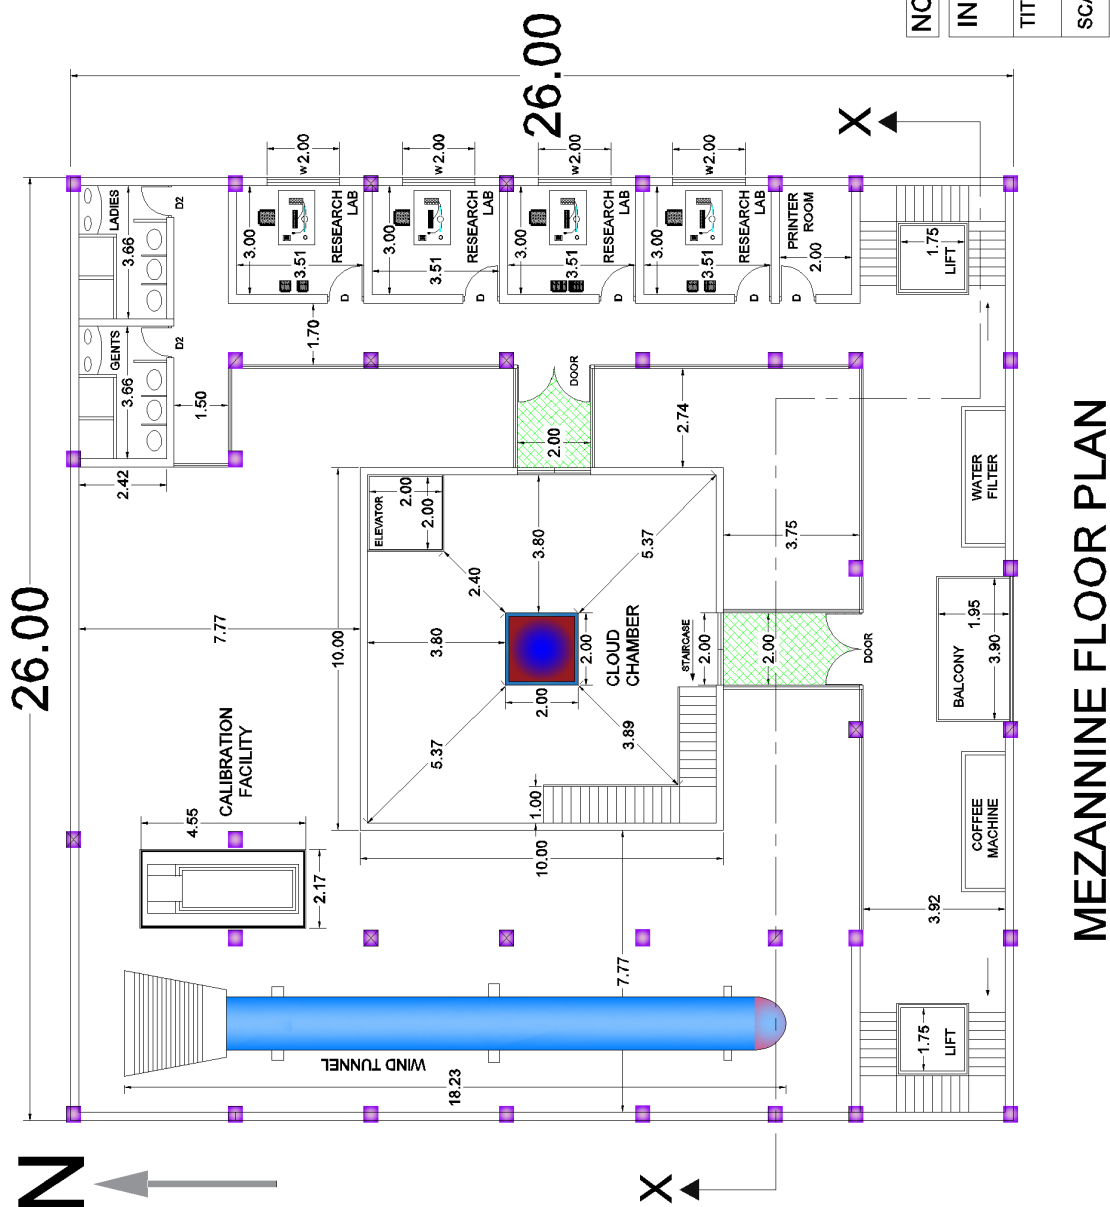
Mezzanine Floor - Plan of the Infrastructure for housing the Cloud Chamber Research Facility
